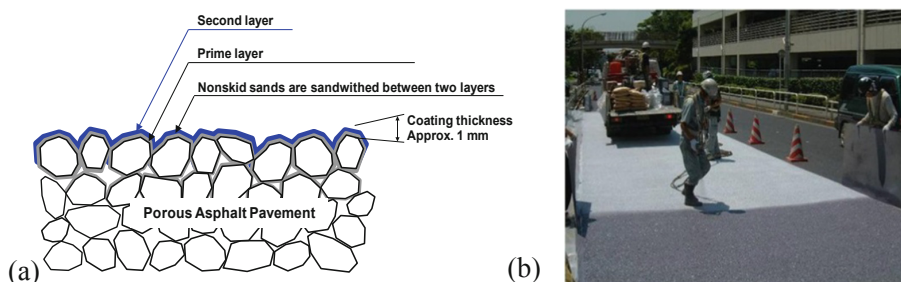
Overview of the pavement (a) Structure, (b) Construction method
